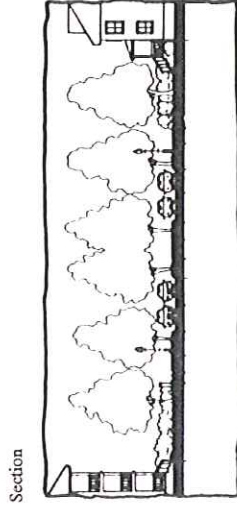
Undivided Collector Street (Source: Bird/Houk)
